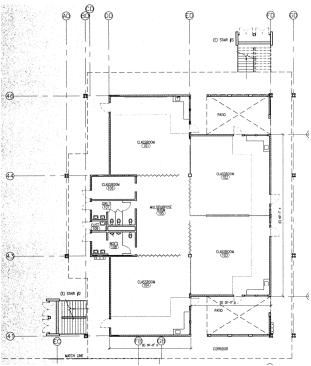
BUILDING 4: 1998 Modernization 1st Floor Plan
